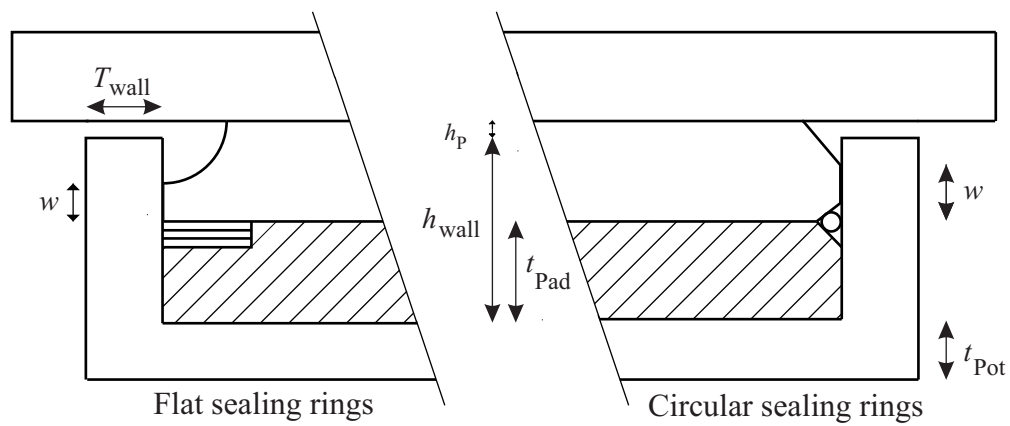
Critical dimensions for clearances according to AASHTO
